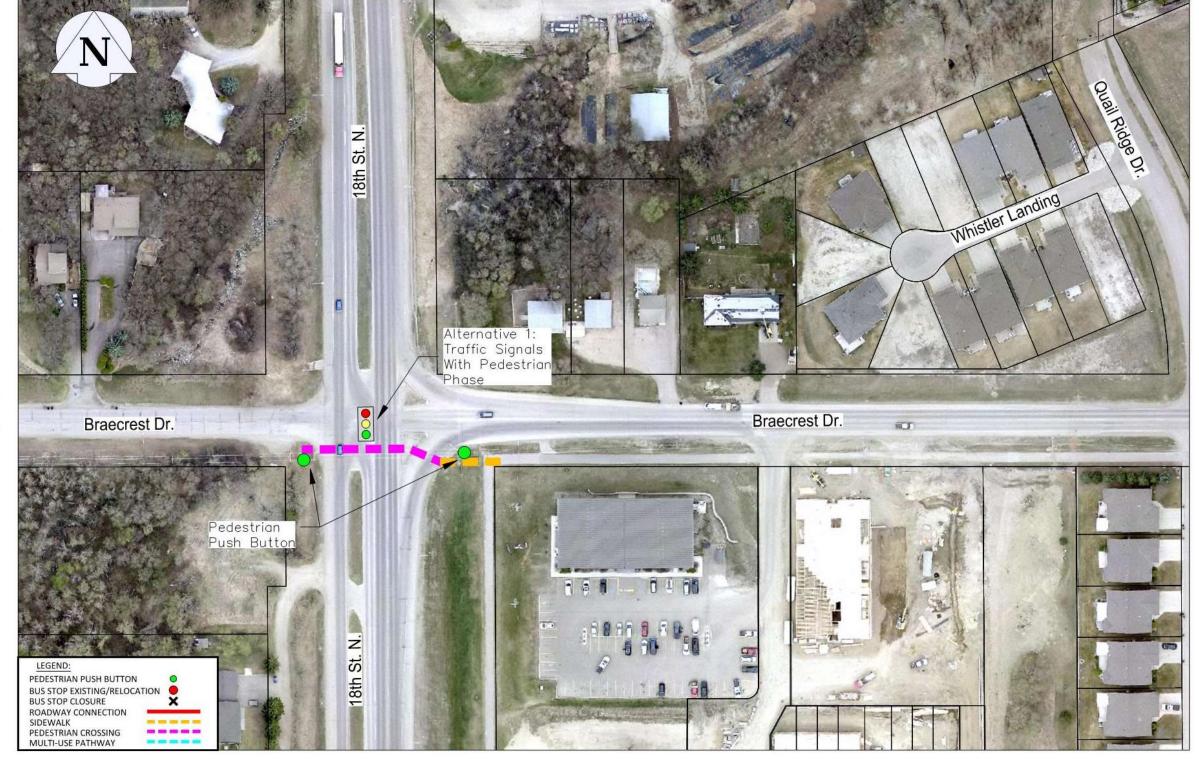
Braecrest Drive and 18th Street North Traffic Management Alternative 1
